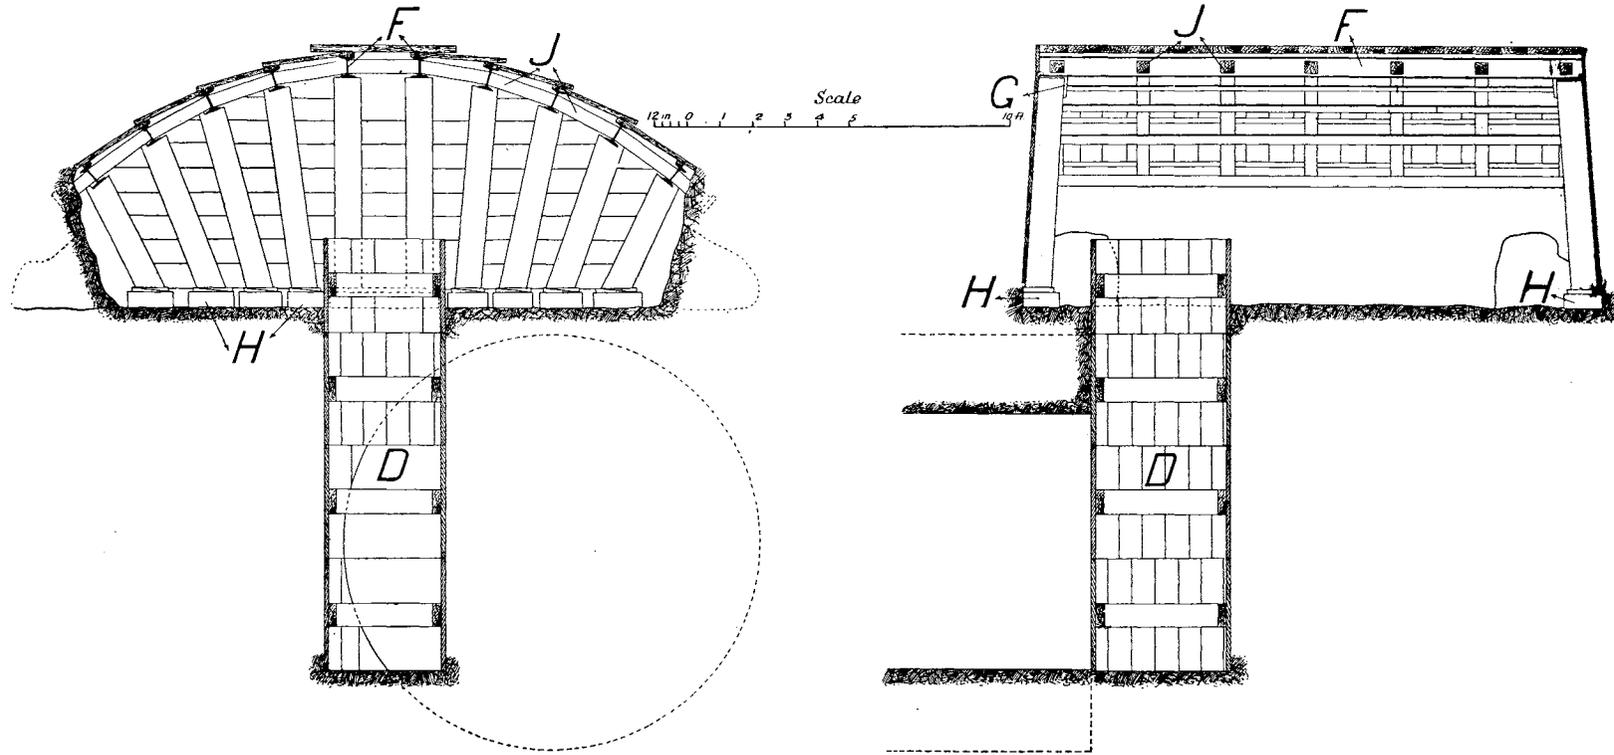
BAKER STREET AND WATERLOO RAILWAY, LONDON.
